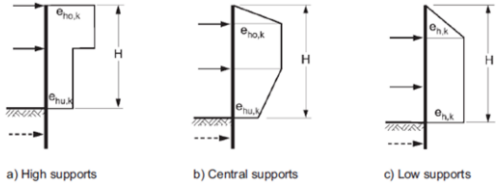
Pressure diagrams for double-supported sheet pile walls and in-situ concrete walls
